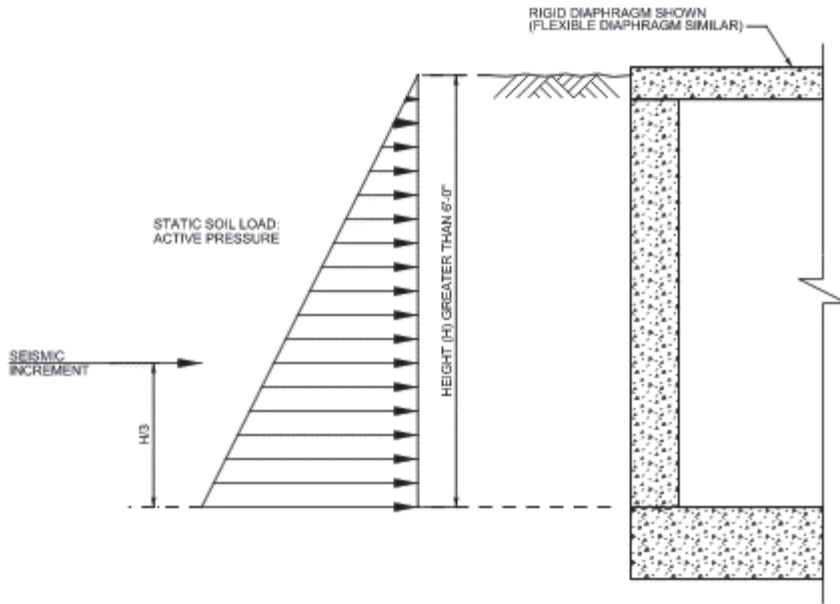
Basement Wall with Backfill height greater than 6'-0"
